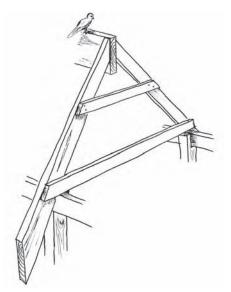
Coupled roof with collar tie, ceiling joist and non-load bearing ridge
